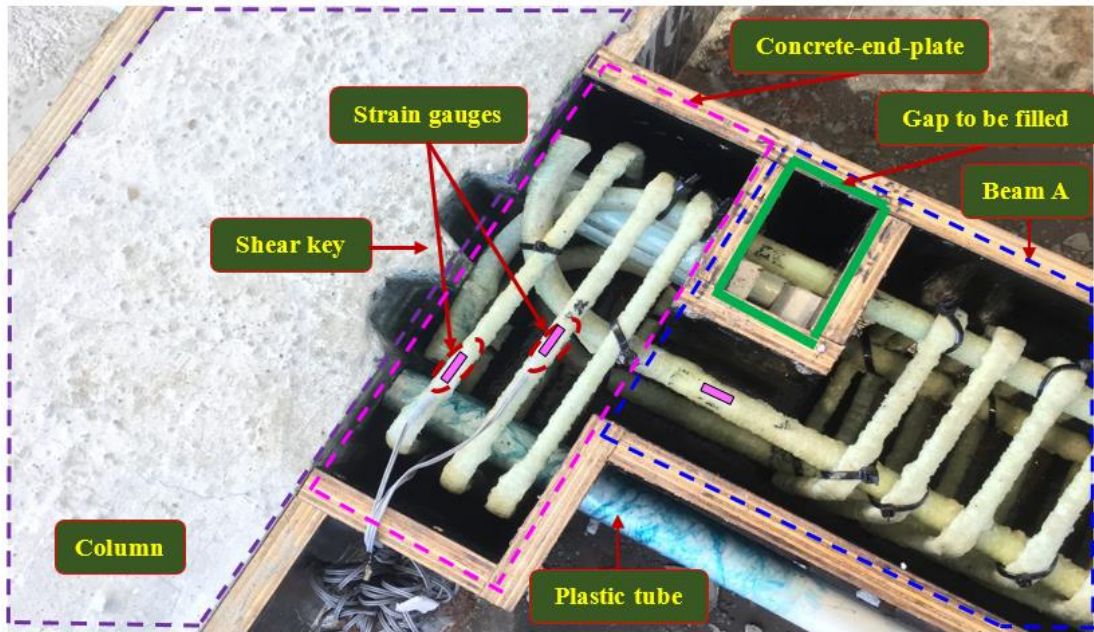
Details of reinforcements, shear keys, and formworks.
